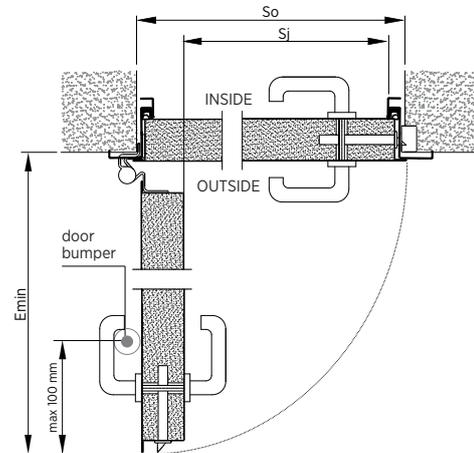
Installation in front of the opening – corner frame without a thermal break – horizontal cross-section
